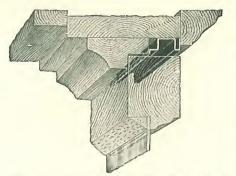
Cross-section through sash and window frame at top showing installation of "AIR-Way" track above sash and tight application of sash.
